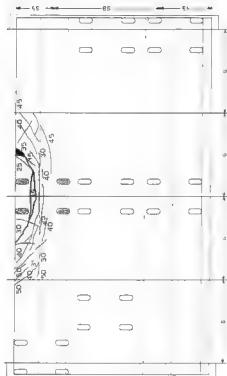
Top Cracking Pattern (Fifth Bridge - Test No 2)
